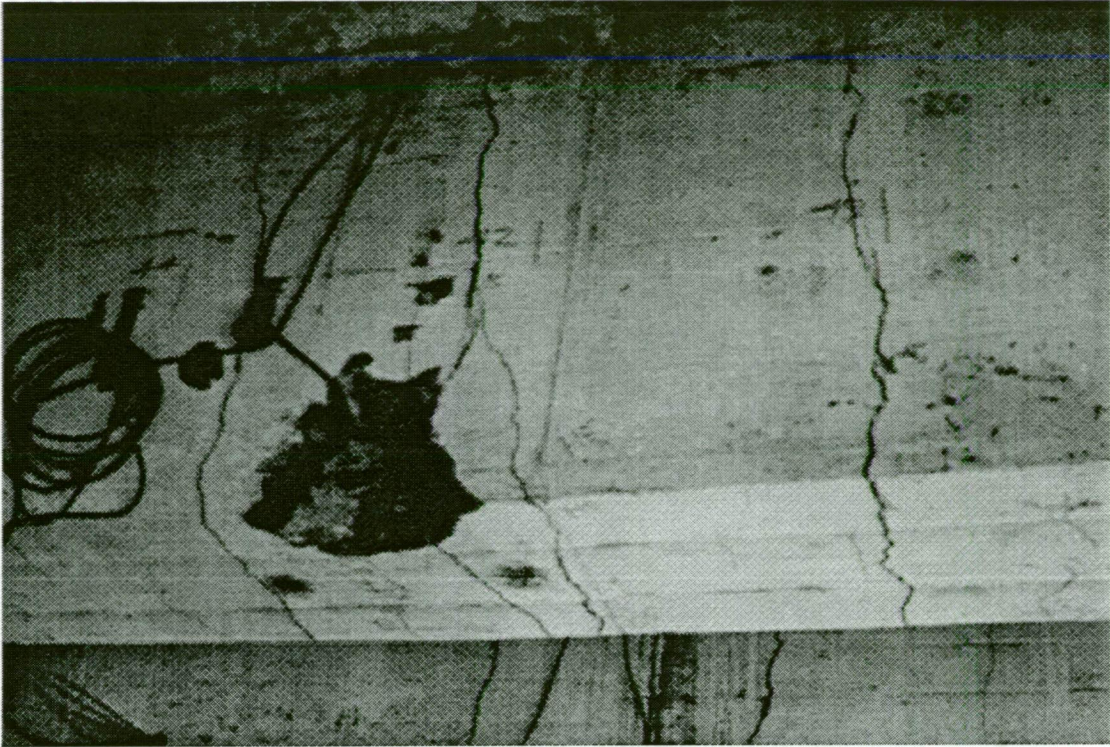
Cracking of Fourth Beam at Ultimate Load
